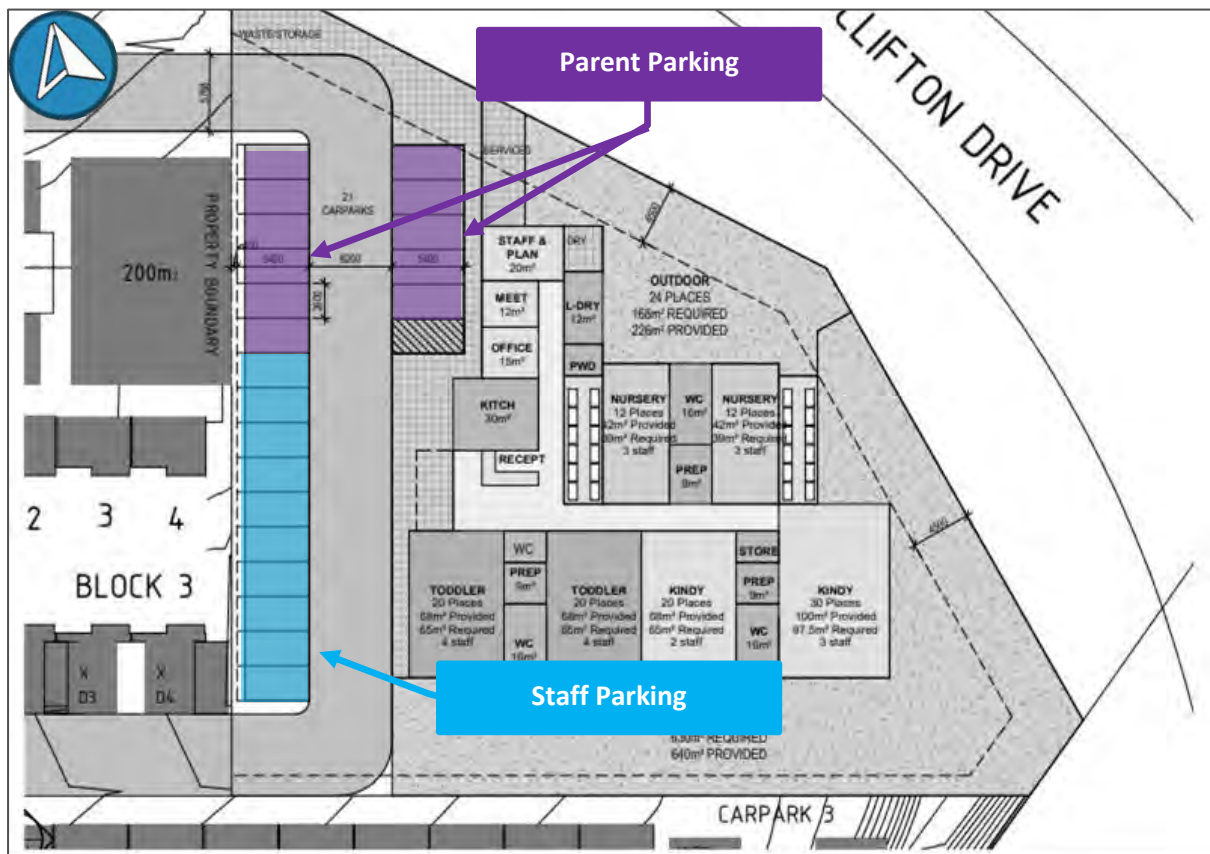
Proposed Car Park Layout (Image Source: Brown Falconer)
